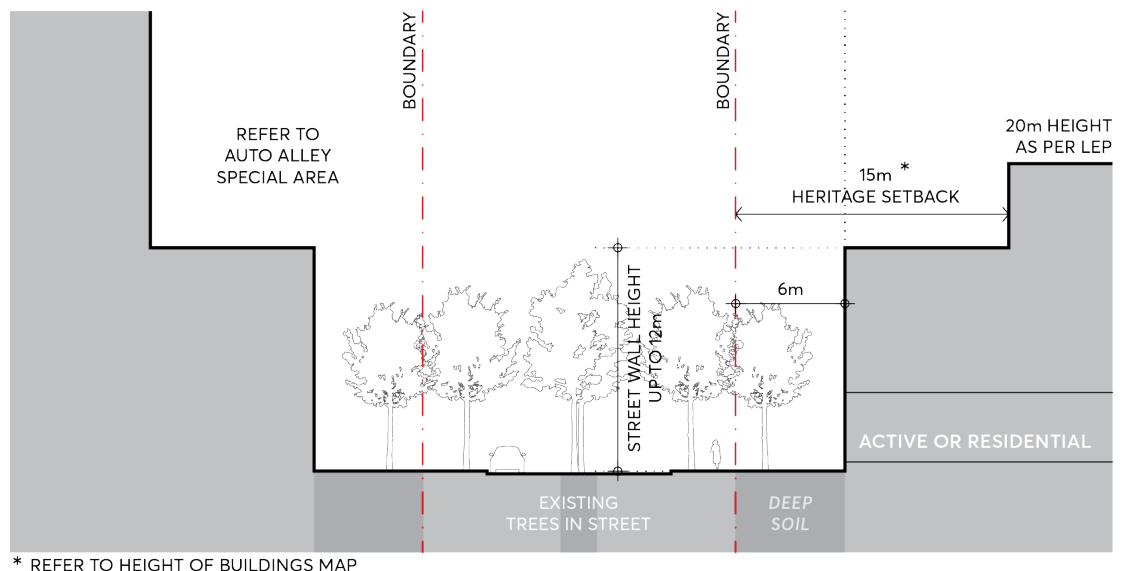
High Street (Section B) Setbacks and Street Wall Height
